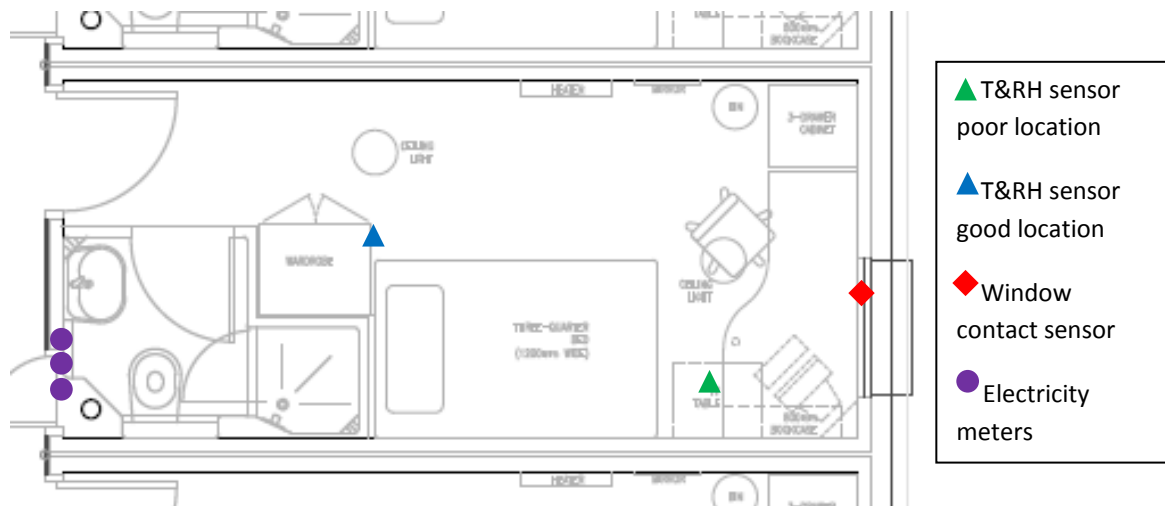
Floor plan marked to indicate location of sensors in pilot study [REDACTED] 2012]
